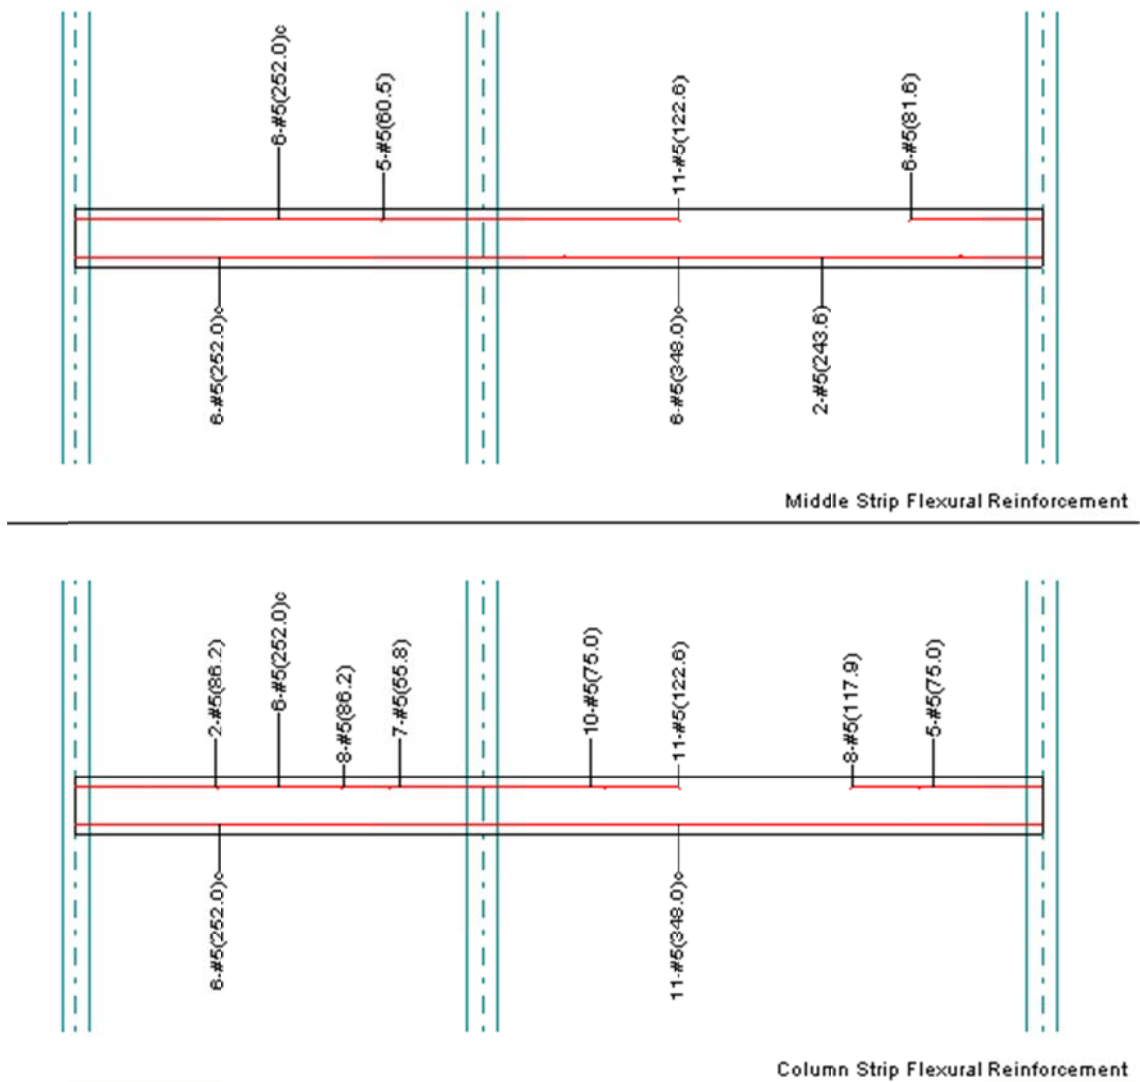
spSlab Column Line 4 Reinforcing Diagram
